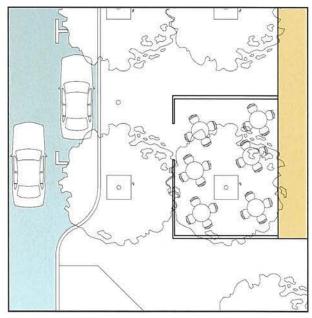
Plan View, Terrace Frontage (Illustrative)
